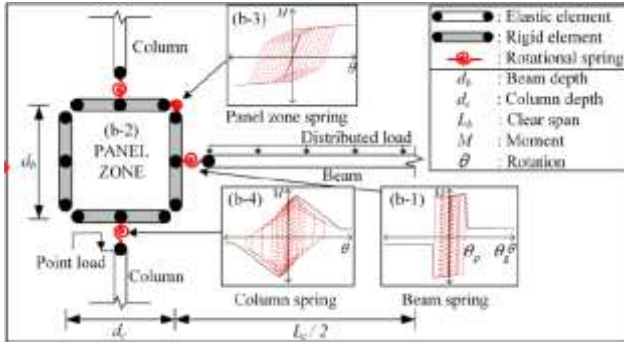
Numerical model for steel OMFs and beam-to-column connections.
